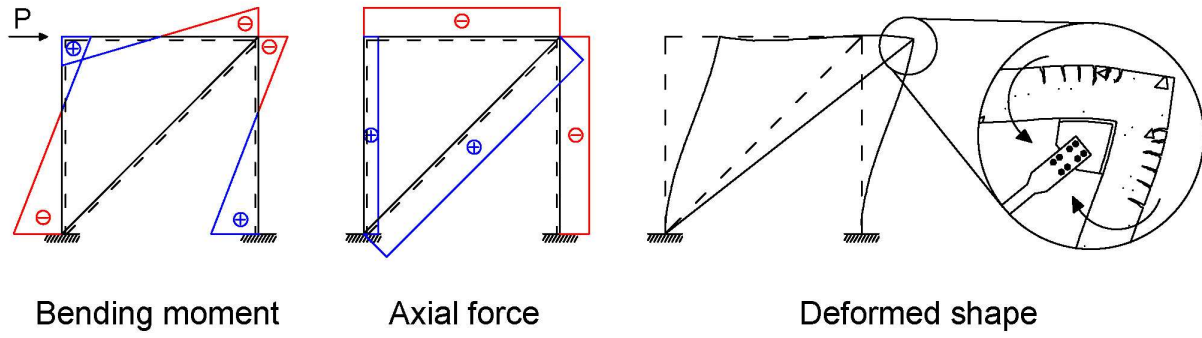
Internal forces and deformed shape of a horizontally loaded braced frame.
